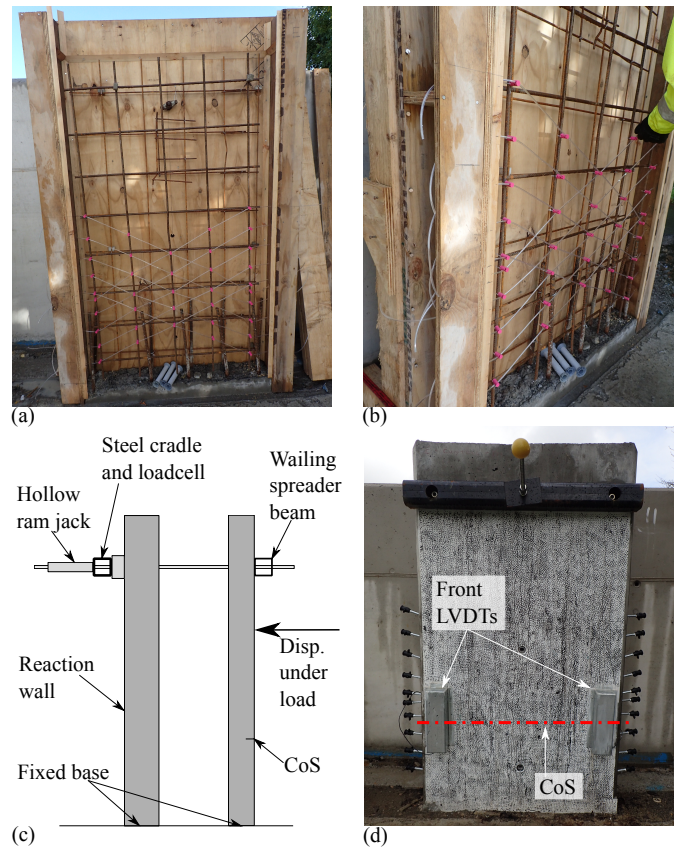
Wall panel testing arrangements (a) Wall panel prior to casting (b) Network arrangement and 2D connection detail (c) Vertical cantilever schematic (d) Wall panel prior to testing
